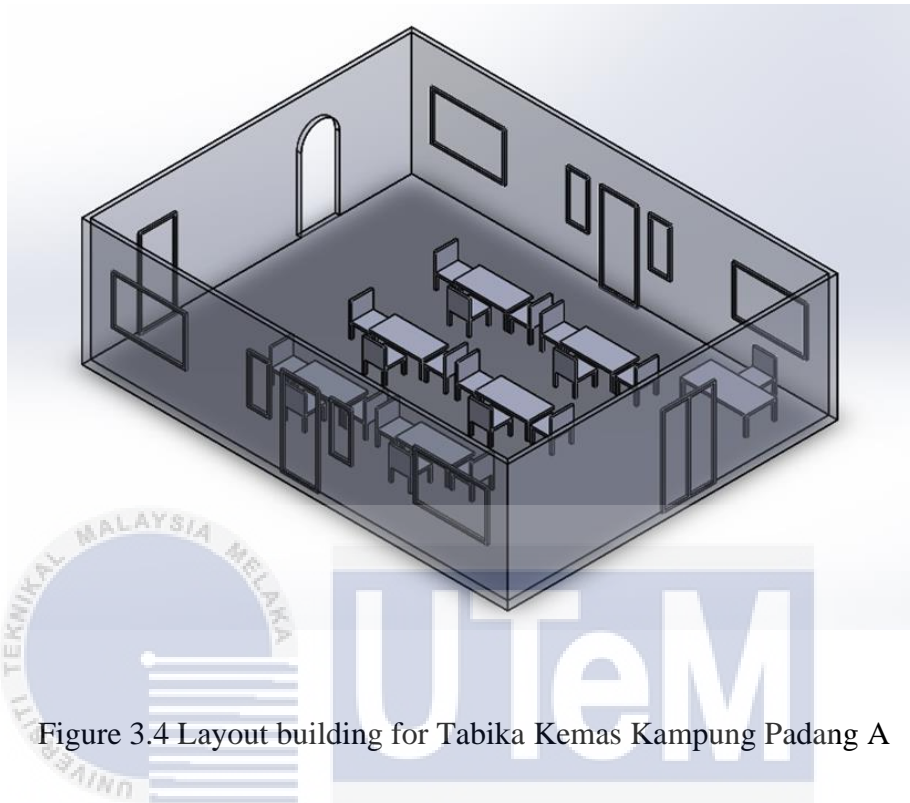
Layout building for Tabika Kemas Kampung Padang A
